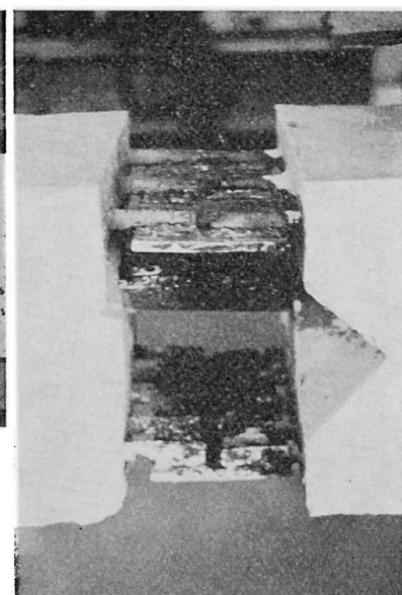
Jointing of reinforcing bars, using steel plates lying under the bars.
